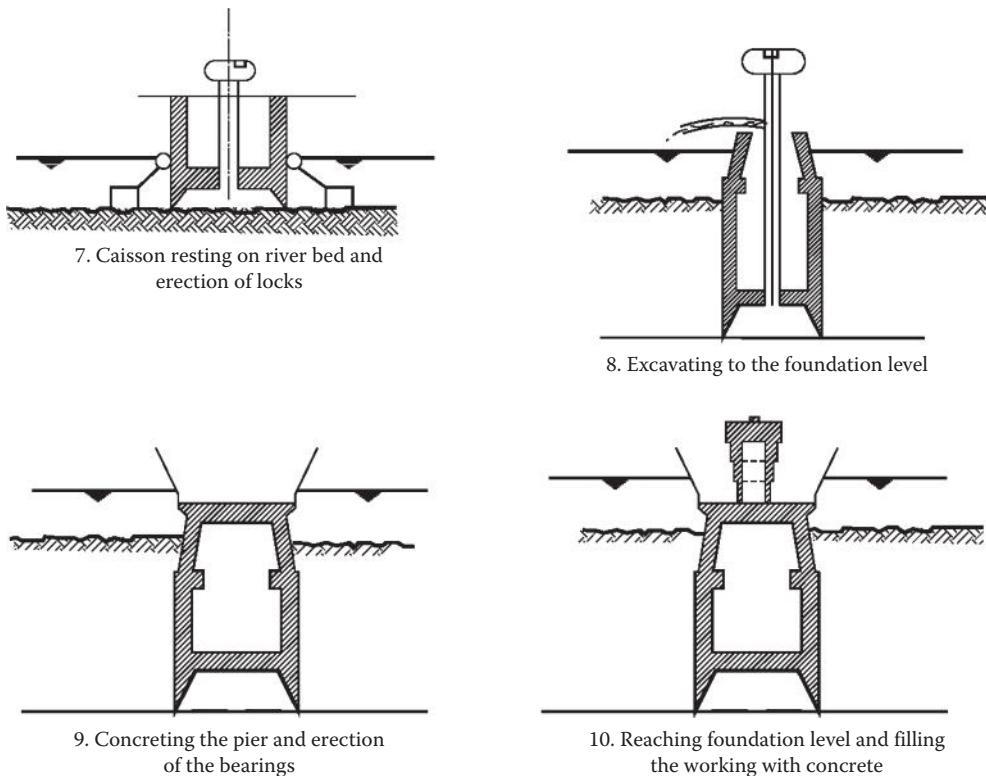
(Continued) Steps of construction of bridge foundations using caissons.
